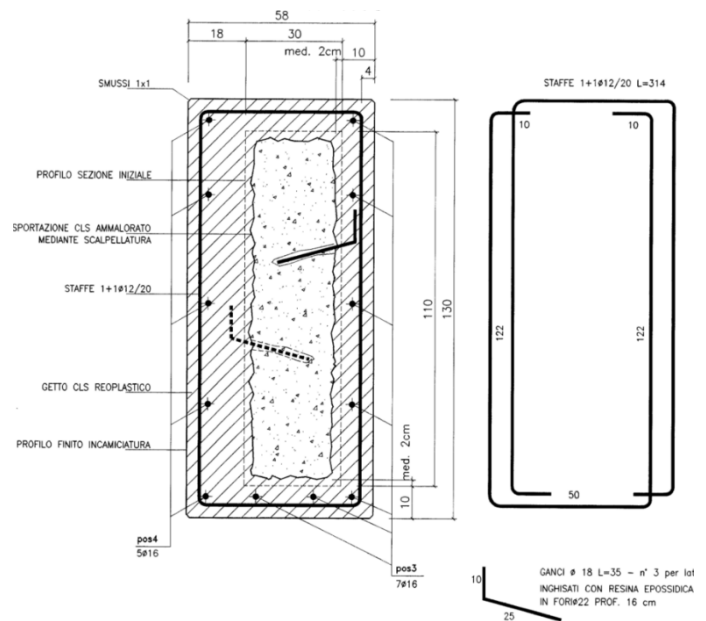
Geometry of the steel RC jacketing of external transverse crossbeam.
